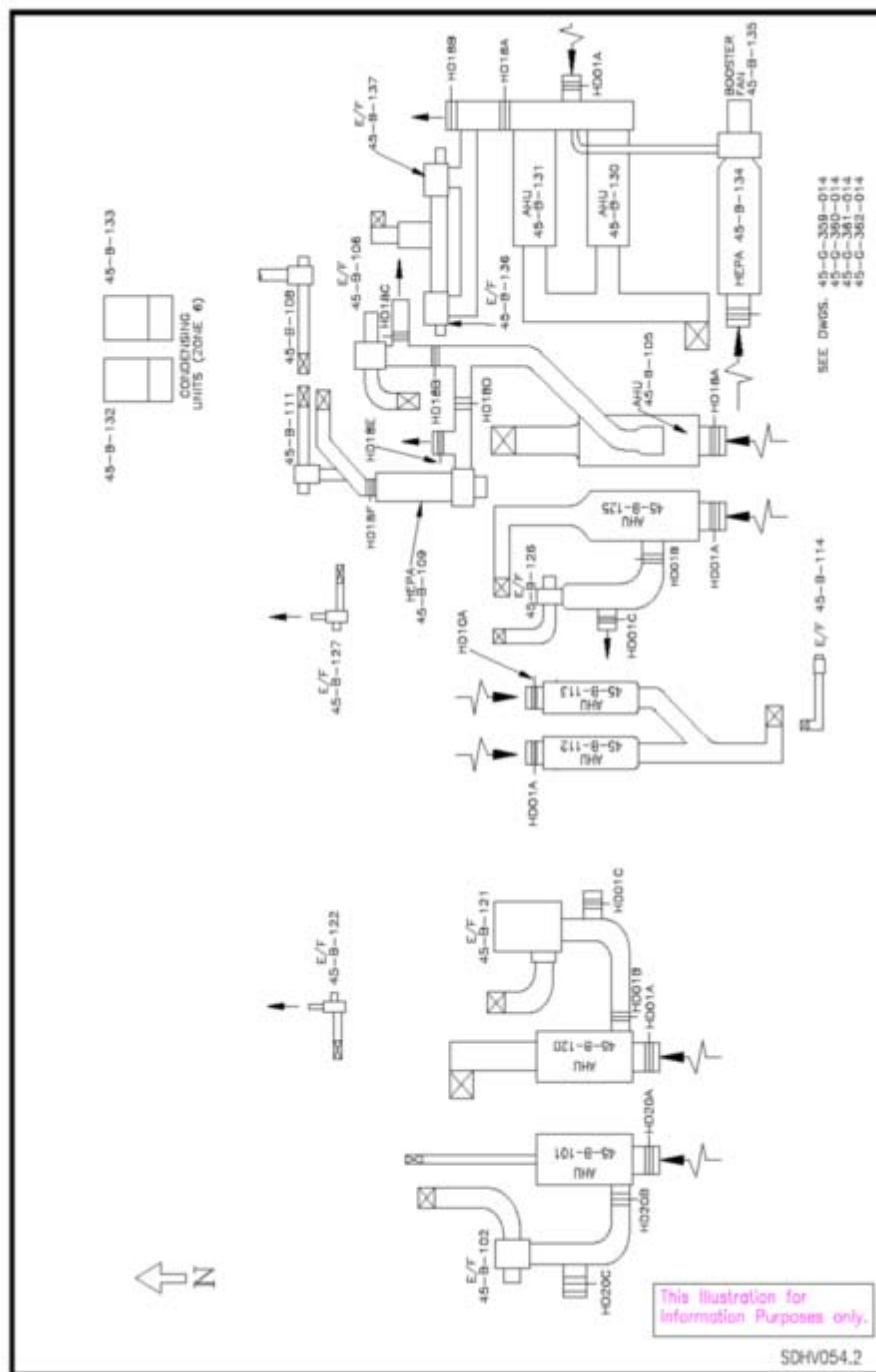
Layout Plan of HV03 Components on Roof of Support Bldg.
